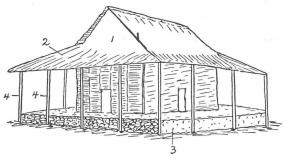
Rarotongan type of house, with surrounding veranda: 1, end, with lower part projected to form veranda roof; 2, veranda roof; 3, house platform; 4, posts supporting outer edges of veranda roof.
